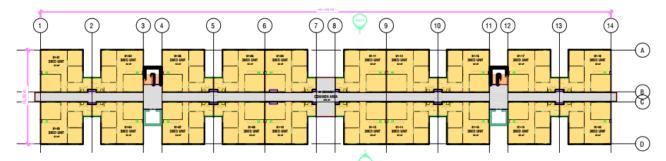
Affordable Unit Typology – Alternative Linear Floor Plan, Three-Bedroom Block
